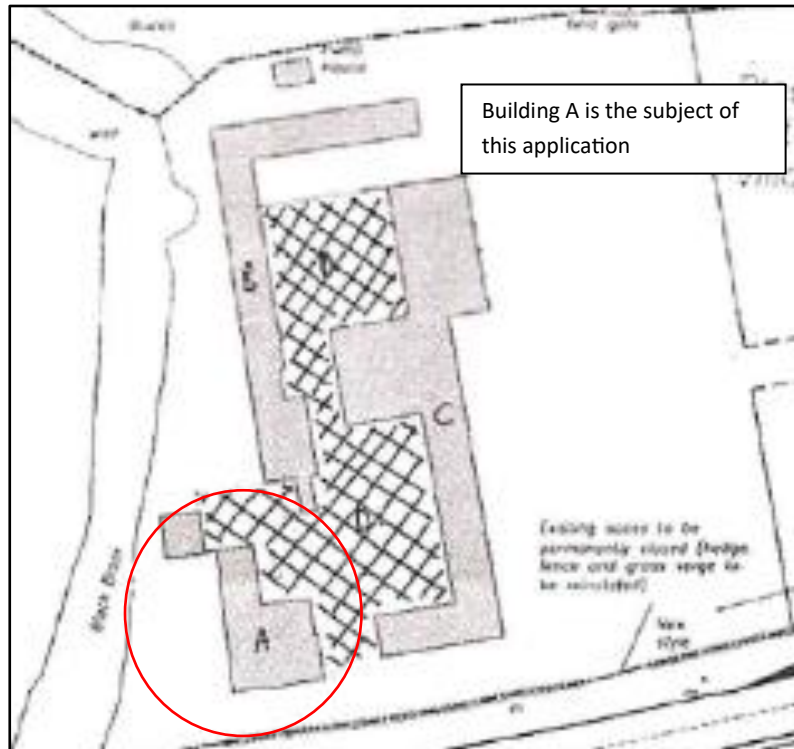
Approved Plan to planning permission 07/00033/COU in relation to planning permission 21/00055/FUL for the removal of condition 2.
